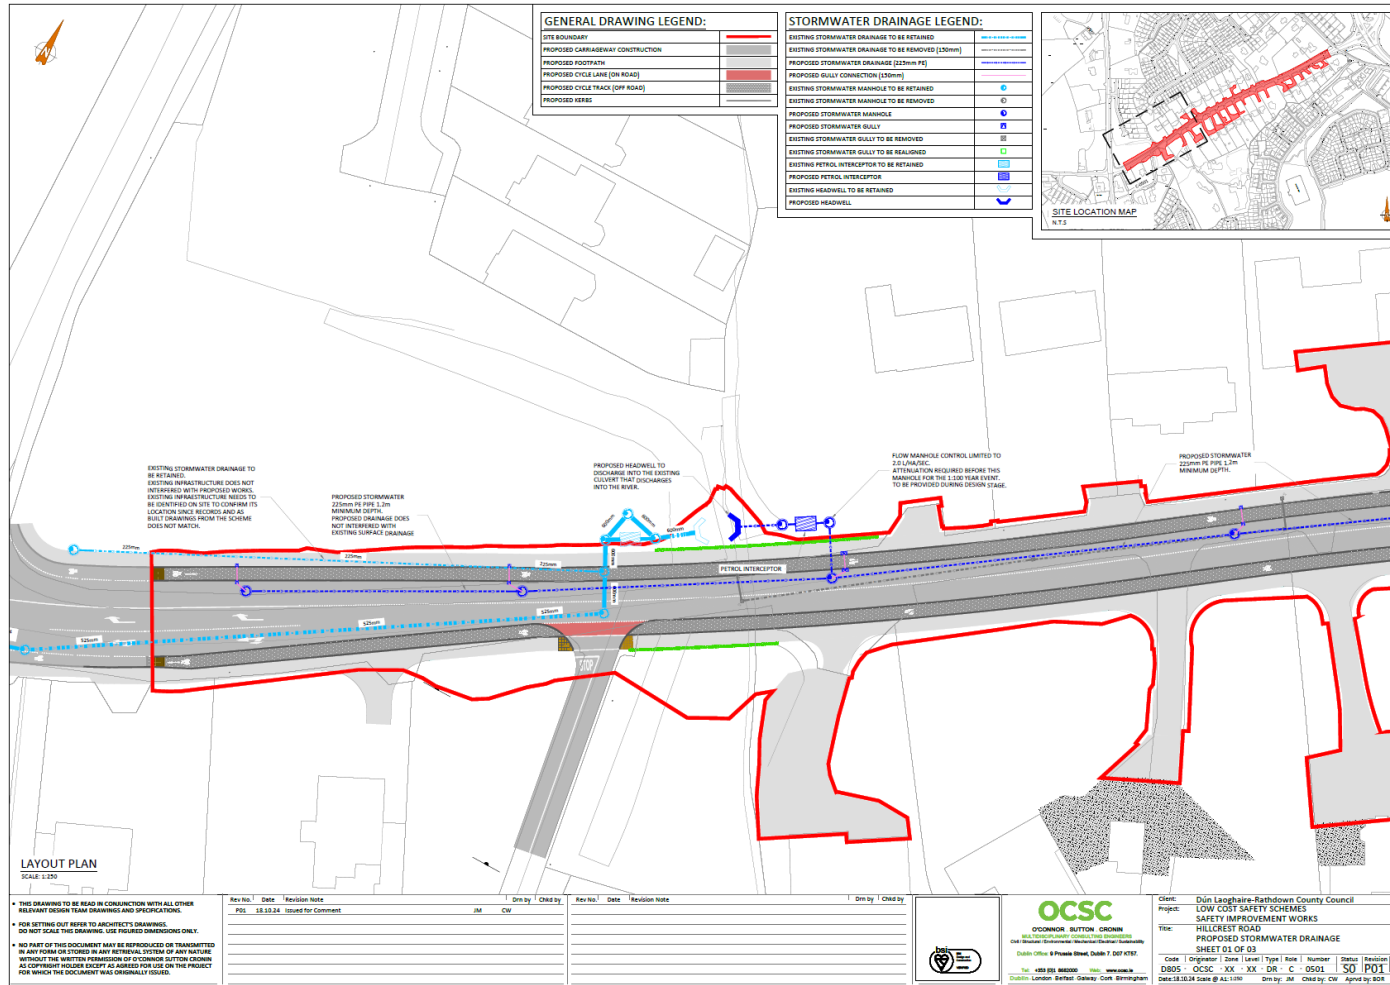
Hillcrest Road Proposed Stormwater Drainage Section C-0501
